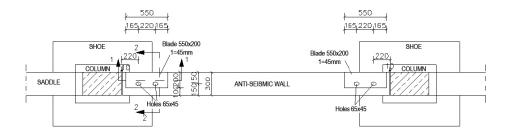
Sandwich"-type wall: Connection between earthquake-resistant (shear) wall and strip footing (floor plan)
